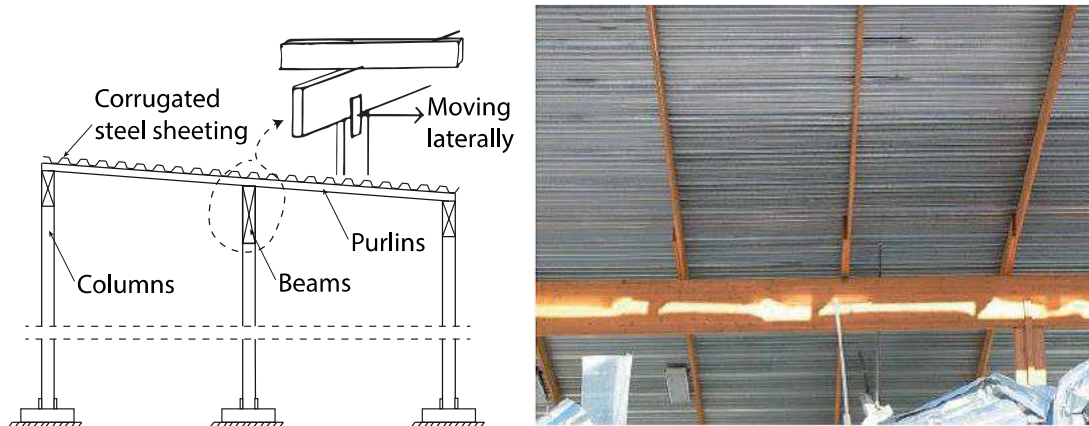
Riding hall. Bracing is lacking on the compressed side of the beams over the supports (columns).*(Johansson et al. [10])
